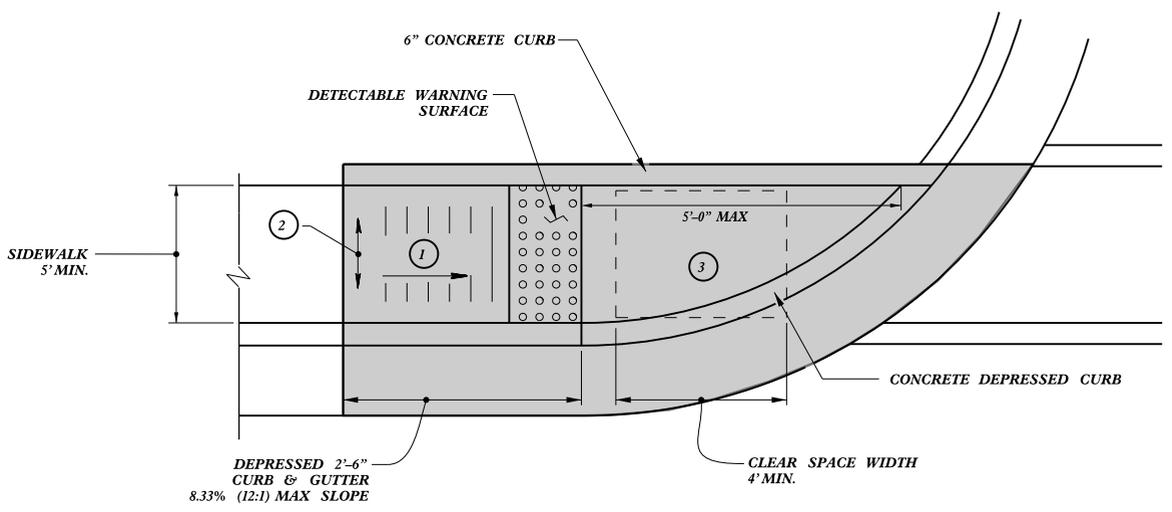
DETAIL SHOWING TYPICAL LOCATION OF CURB RAMPS,
